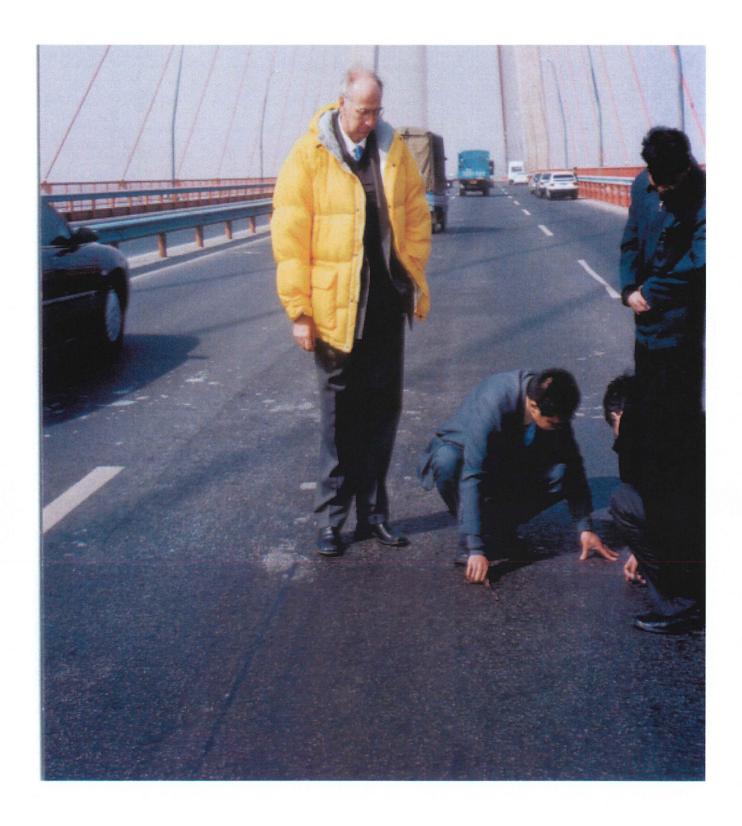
Inspection of Bridge Deck - Three Months Later
